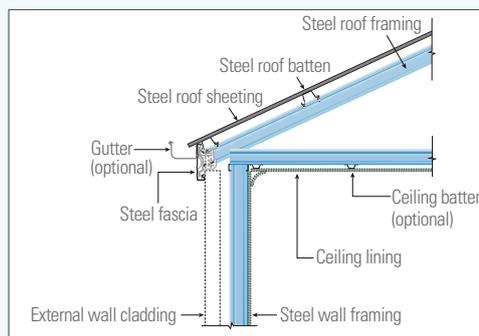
Roof system – without eave, BAL-12.5 to BAL-40
